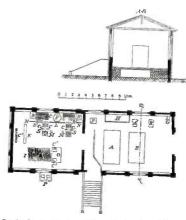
Ground Plan and Elevation of Rome Radio Station, ..
